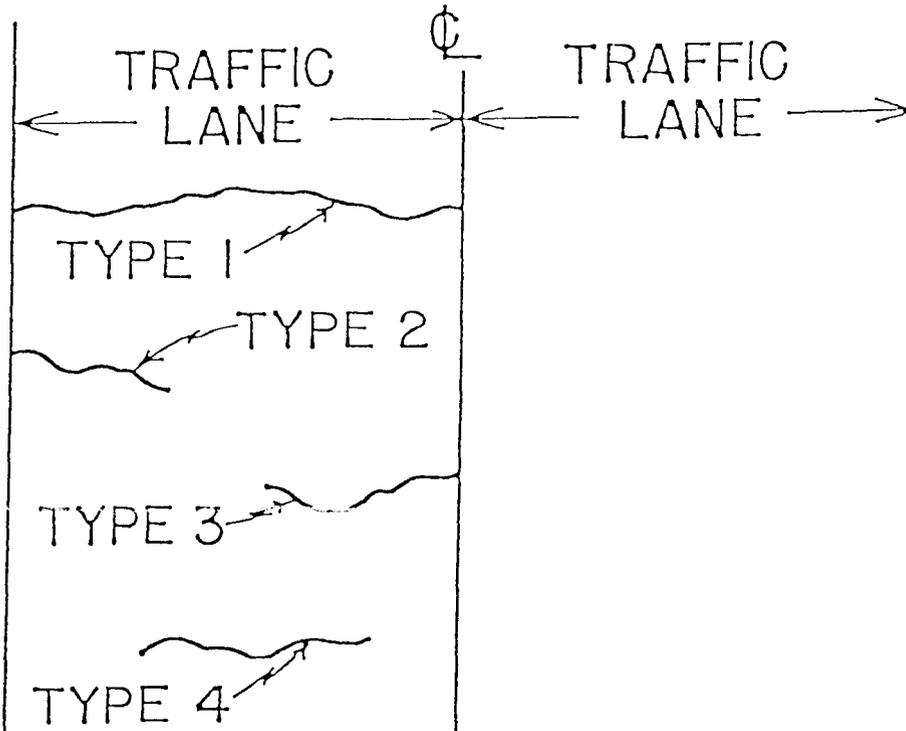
TYPES OF TRANSVERSE PAVEMENT CRACKS
